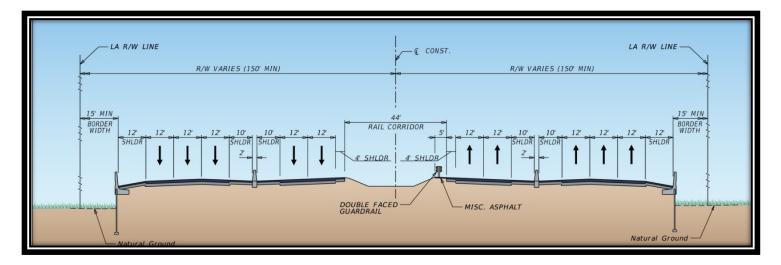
Proposed Typical Section (6 GUL +4 EL with rail envelope) – E. of Central Florida Parkway to SR 528
